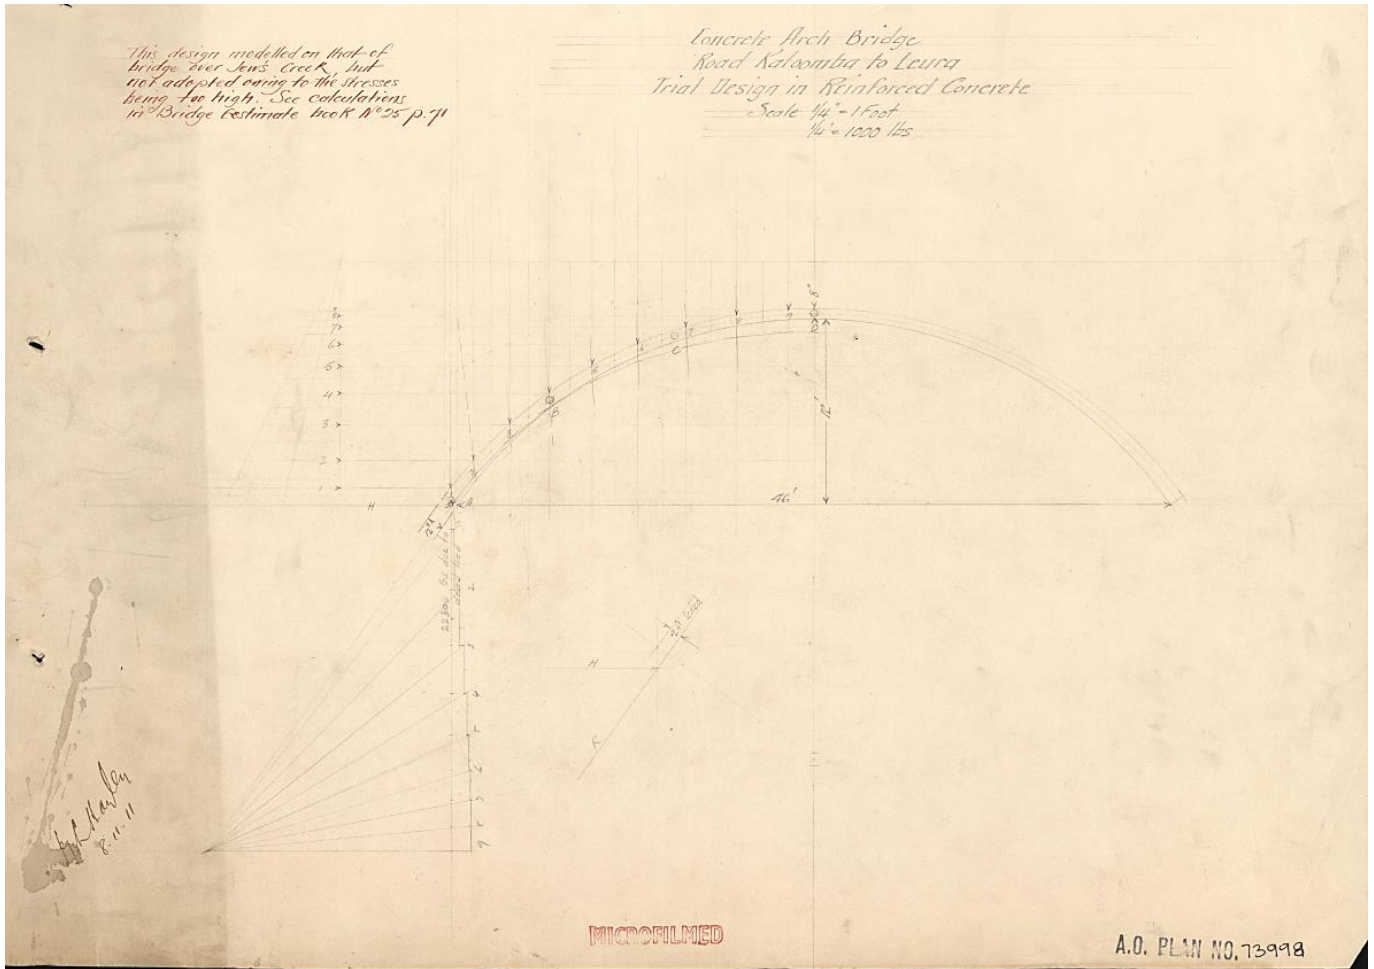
Trial Design in reinforced concrete, not used, stress diagram, Public Works Department 1912. (AO Plan No 73998).
